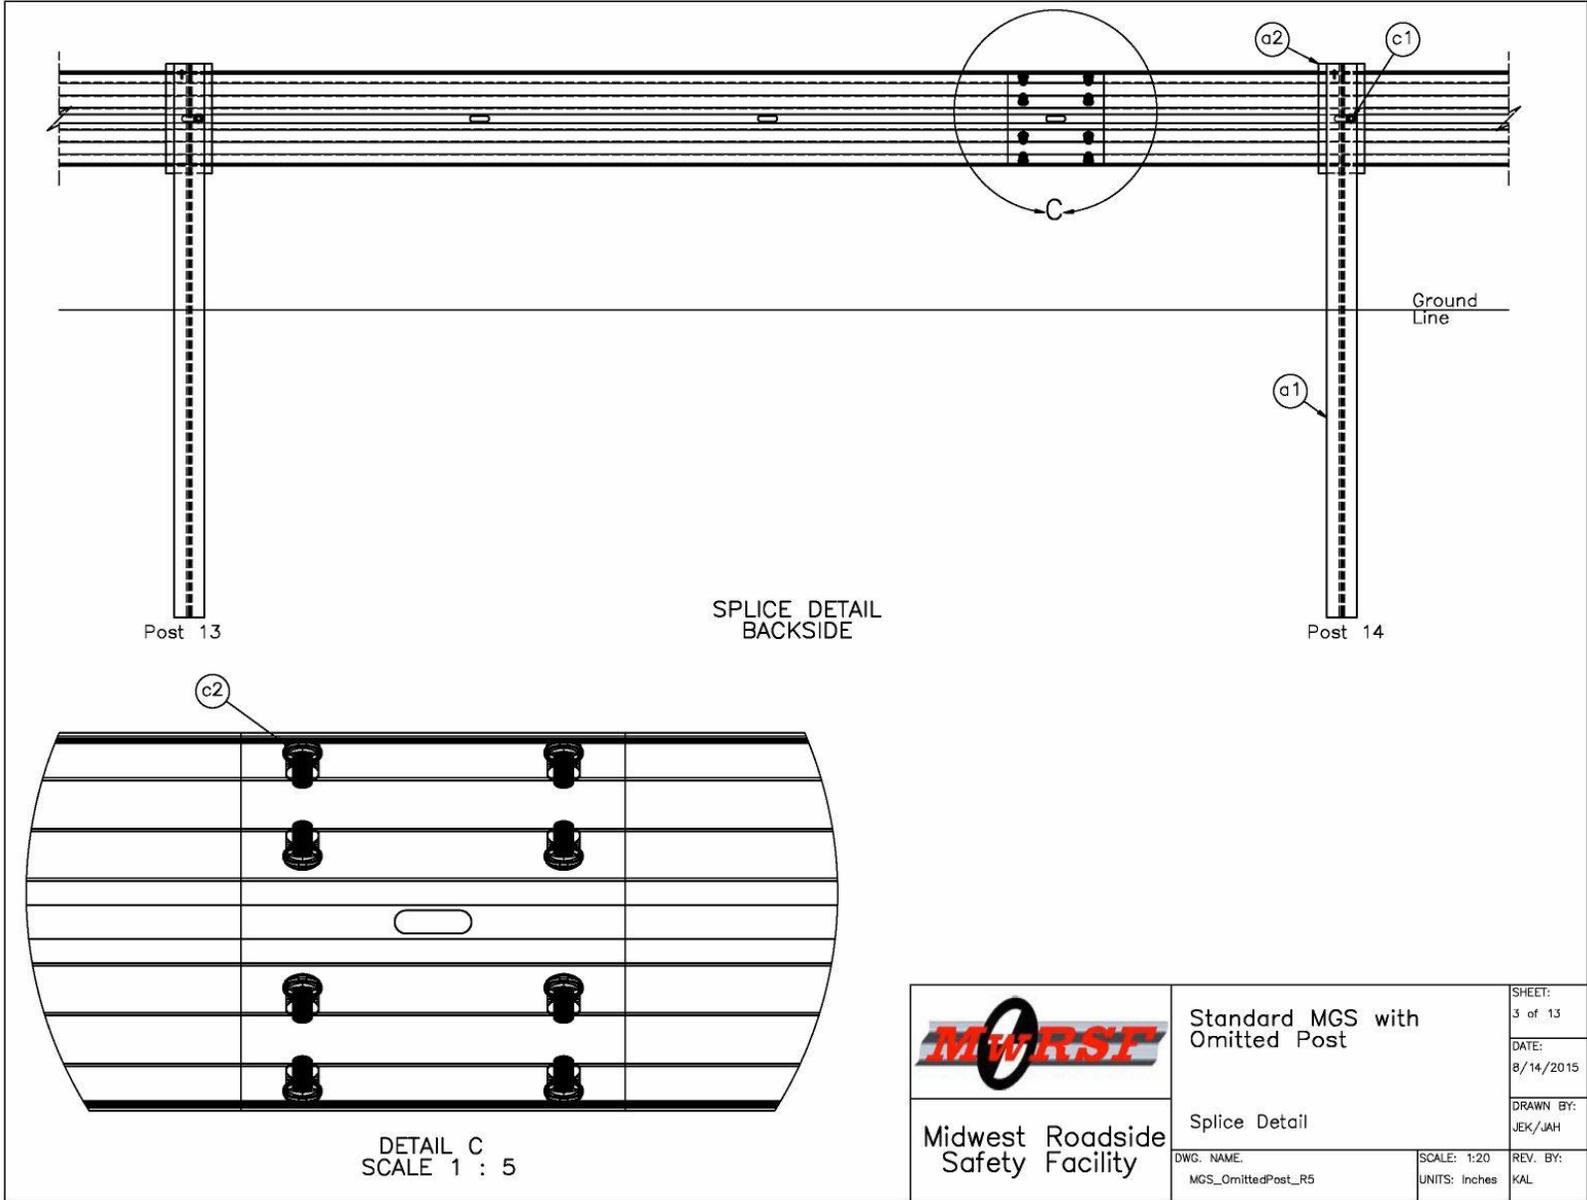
End Section and Splice Detail, Test No. MGSMP-1
